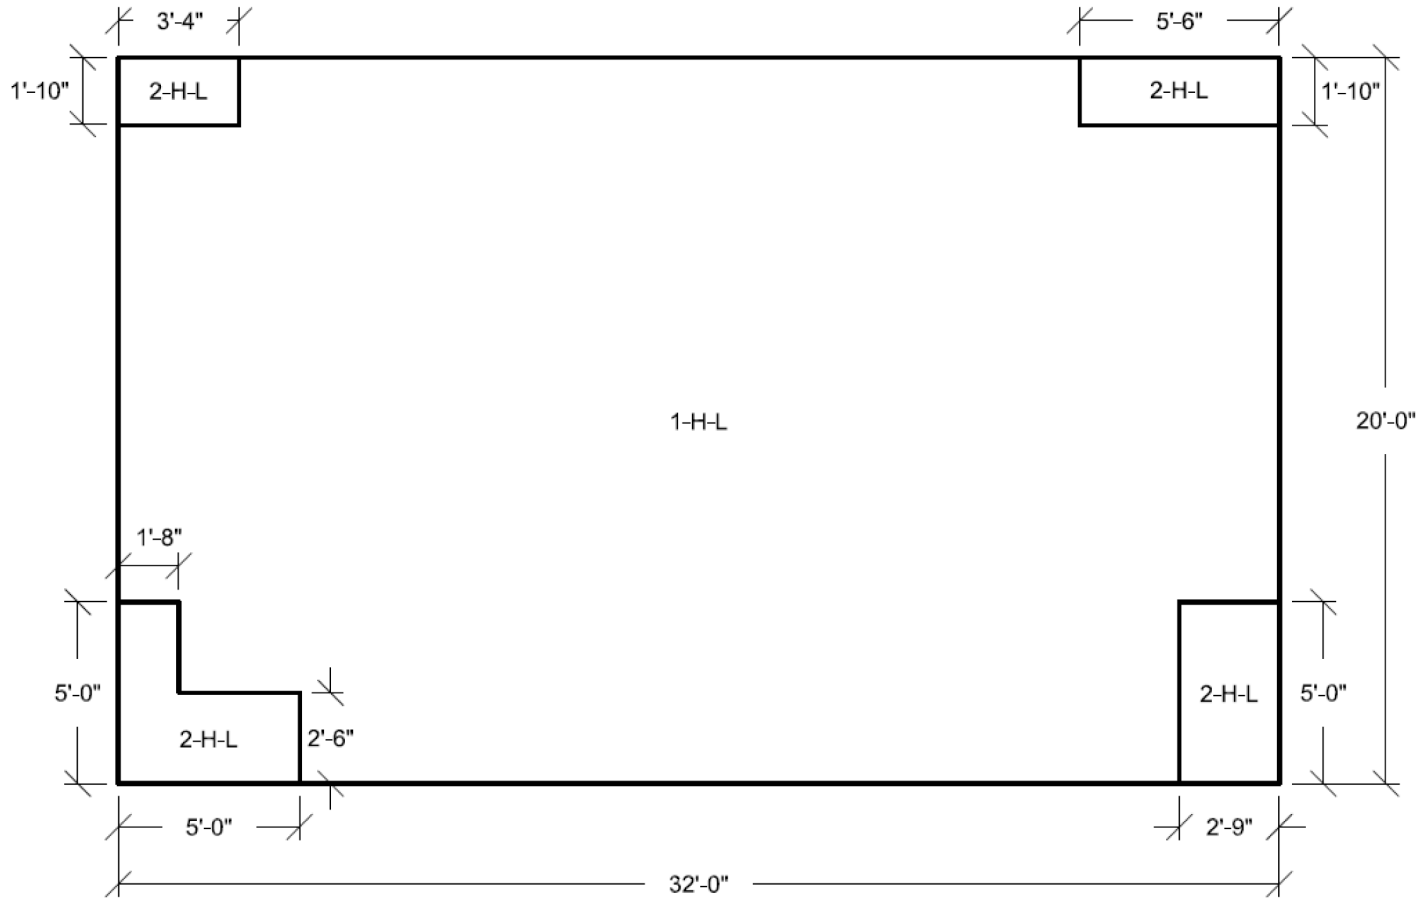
H.6-202 DGFOV Wall 15 Looking From Outside
